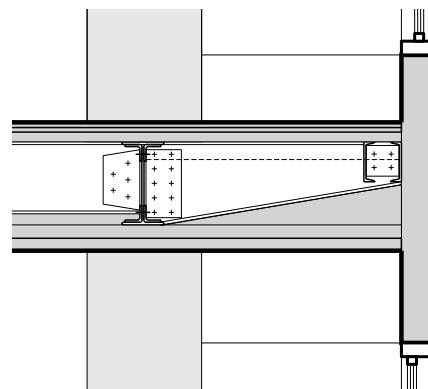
Cantilevered bay window bracket showing steel detailing. (Drawing by author, based on Centre Canadien d'Architecture drawings DR1986:0767:315 and DR1986:0767:234).
